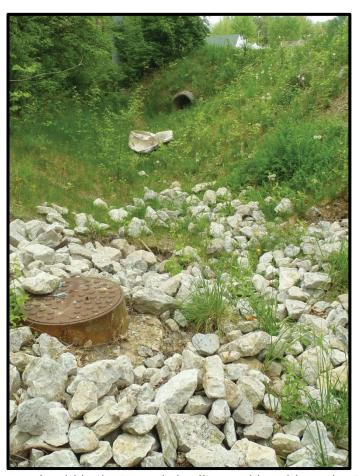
Drainage swale within the transmission line corridor with a culvert and drain near Structure 9. Image taken looking south on May 6, 2013.
